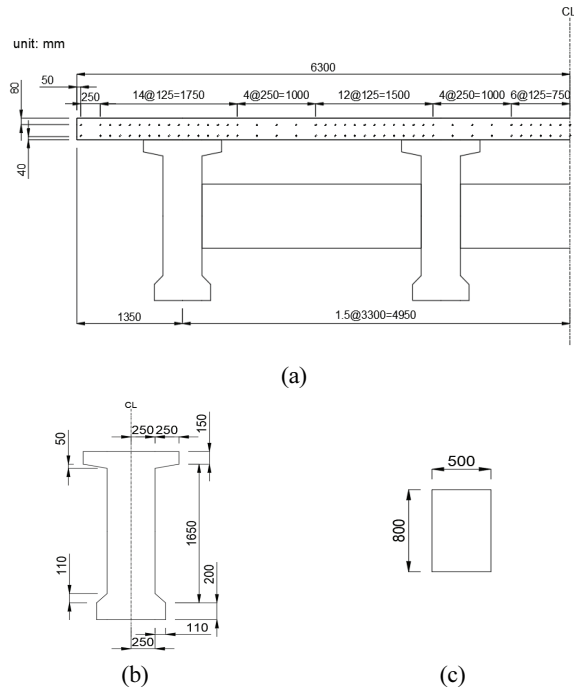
Cross section of PSC I-girder bridge: (a) half size of the bridge (b) girder (c) cross beam
